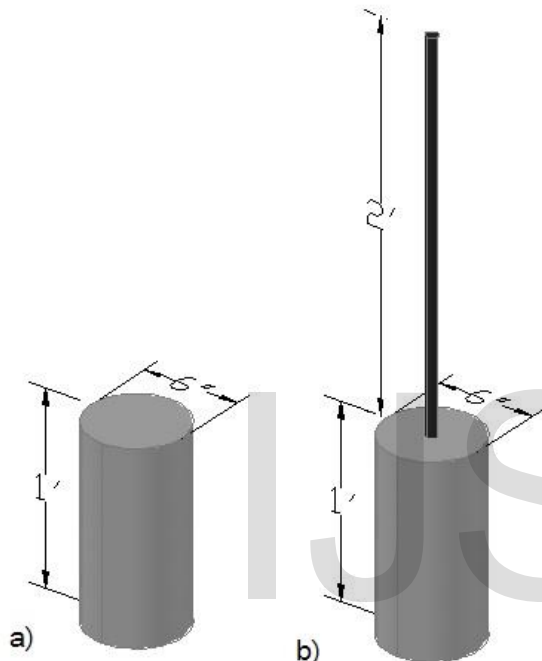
a) Compressive test specimen b) Pull-out bond test specimen
